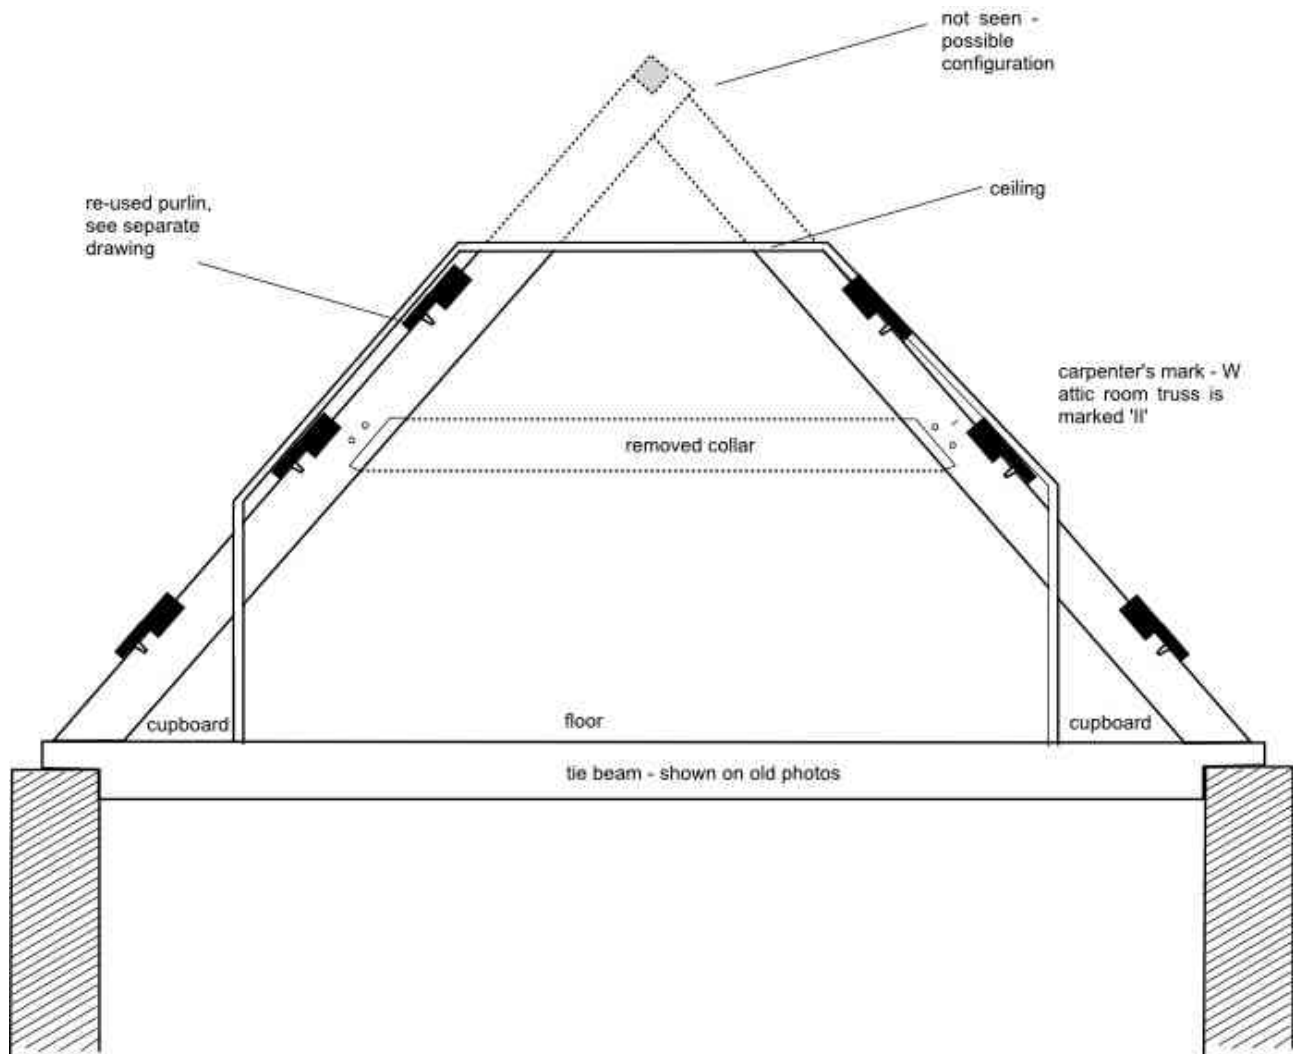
Sketch sectional drawing of the E roof truss (I) of the house viewed from the W.
